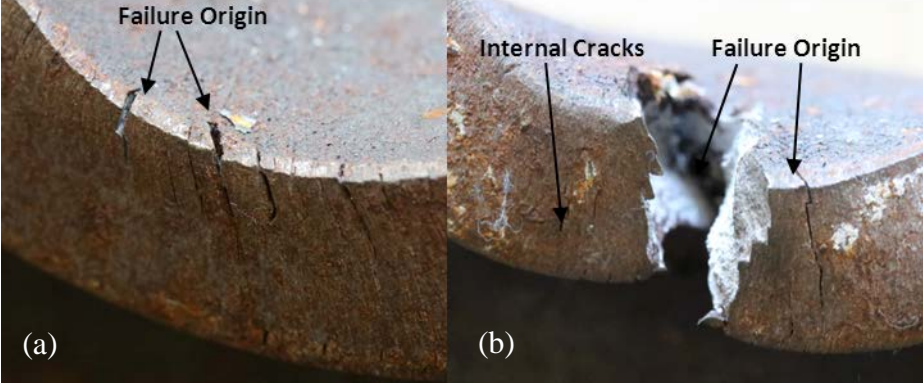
Crack Initiation at Two Different Locations on Both Sides of the Bottom Flange. Crack and Fracture Initiation (a) and Crack Initiation at Other Side of the Flange (b)
